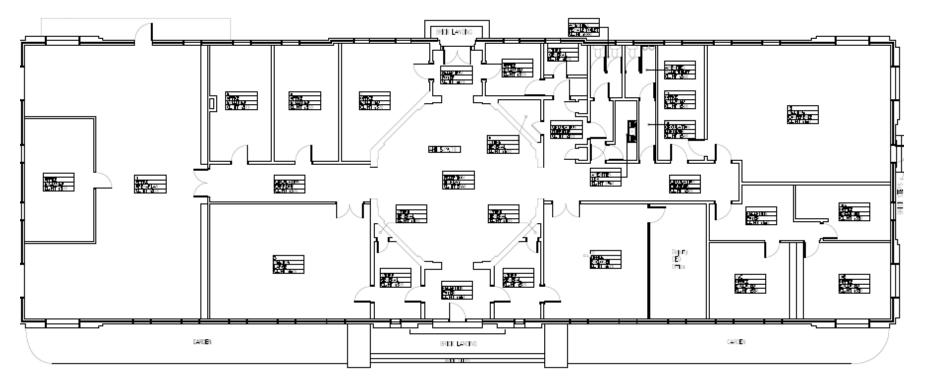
Current floor plan of AFS building (Oakstand 2020)
